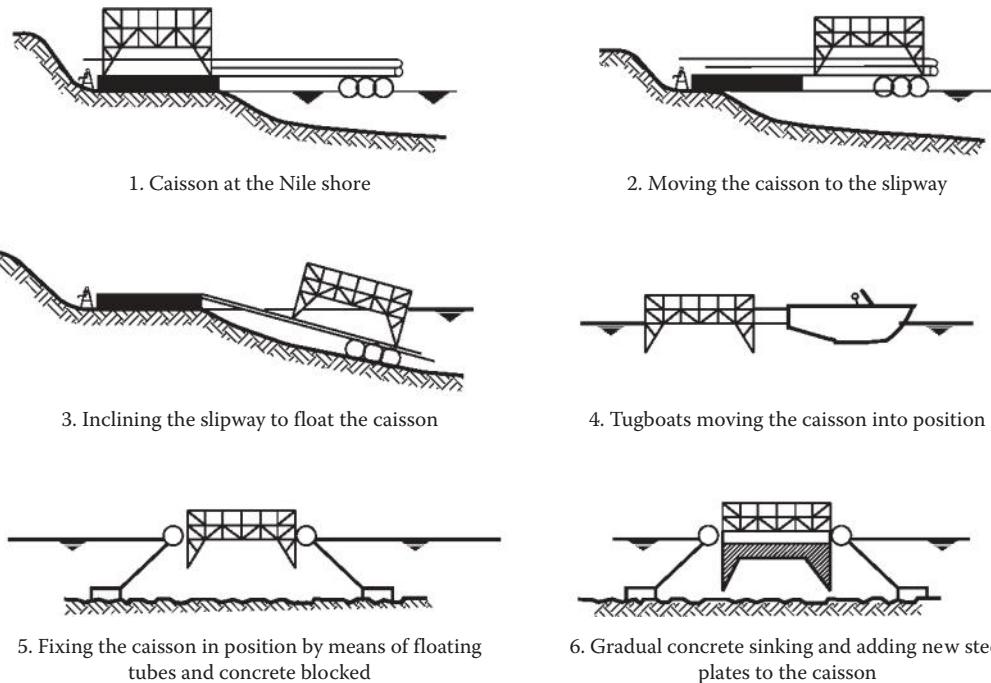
Steps of construction of bridge foundations using caissons.
